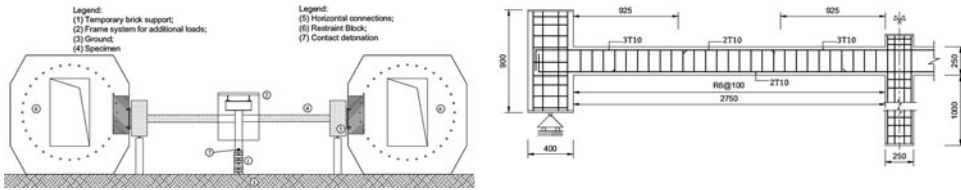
Specimen setup and reinforcement detail (Pham, Tan, and Yu 2017).
